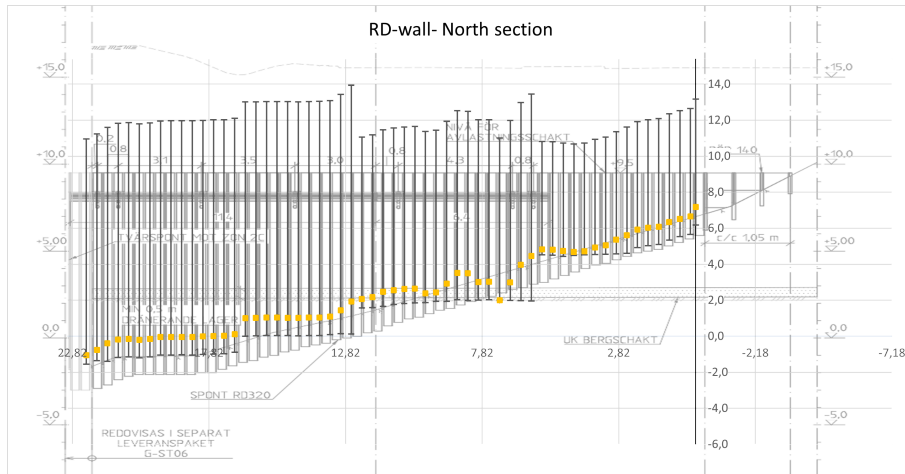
Rock surface model with pile wall level based on drill-protocols, North wall
